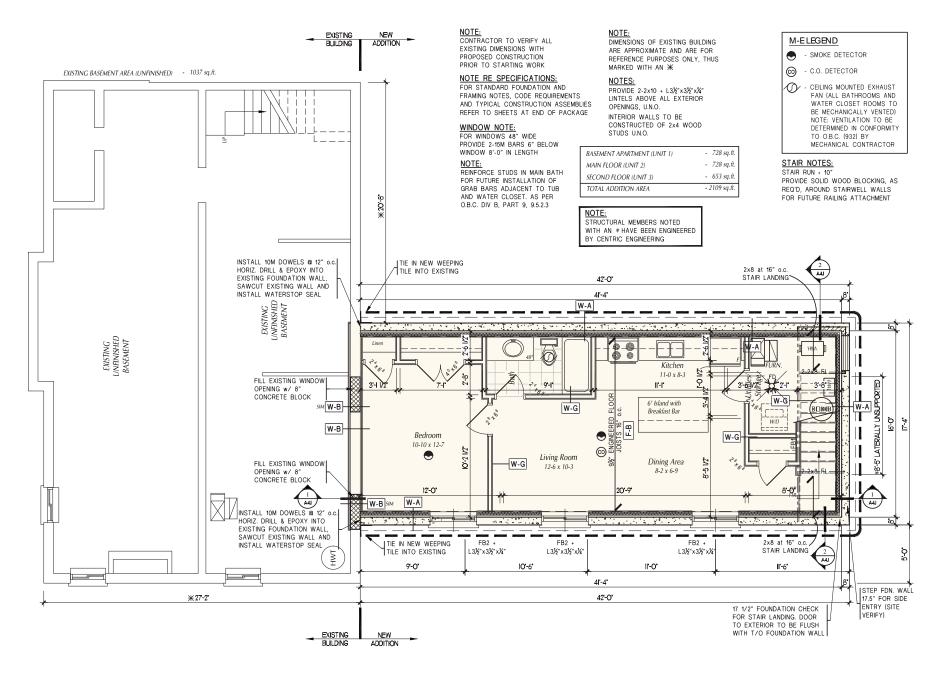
Basement Floor Plan prepared by Orchard Design Studio Inc
